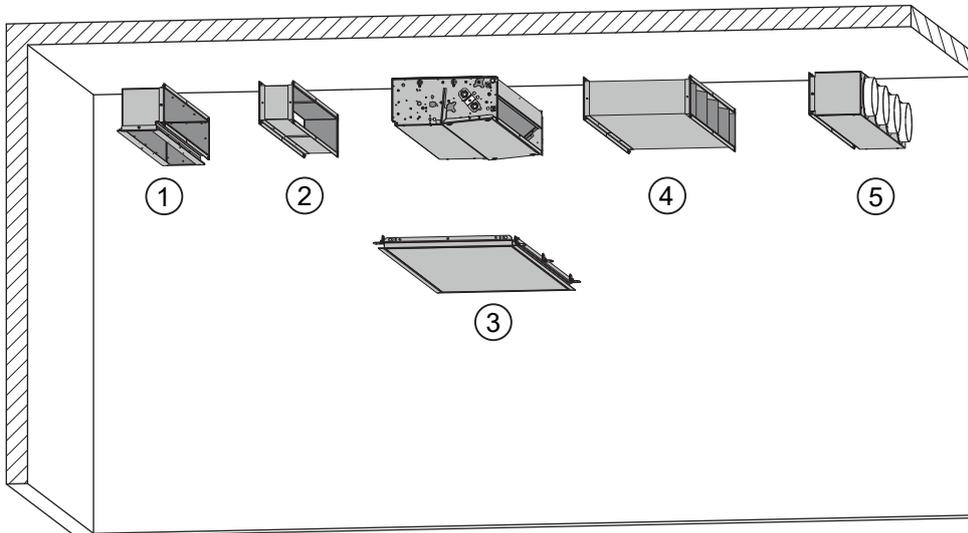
Schematic layout of steel sheet accessories for ceiling mounting
